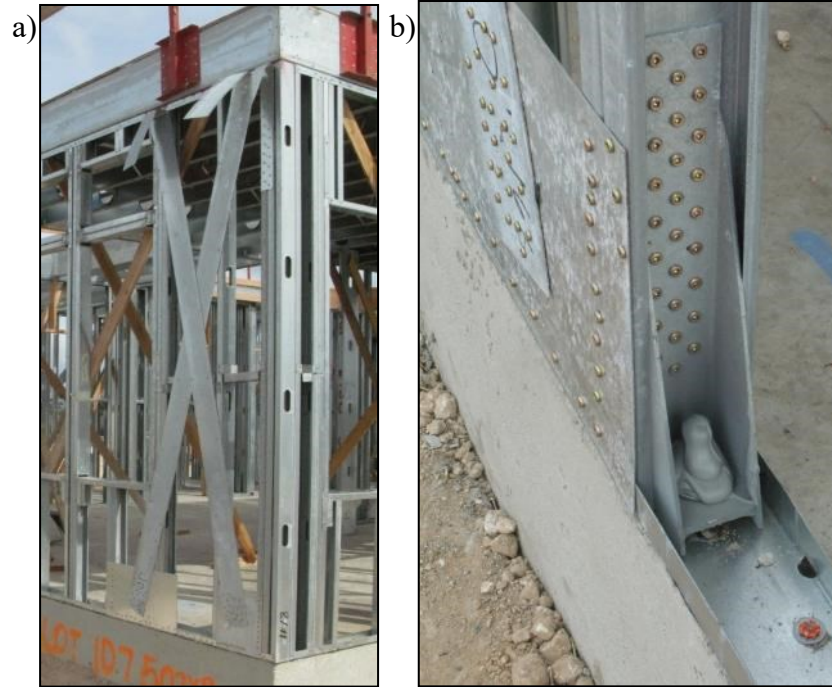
a) Typical narrow diagonal strap-braced cold-formed steel wall, b) hold-down device and gusset plate
